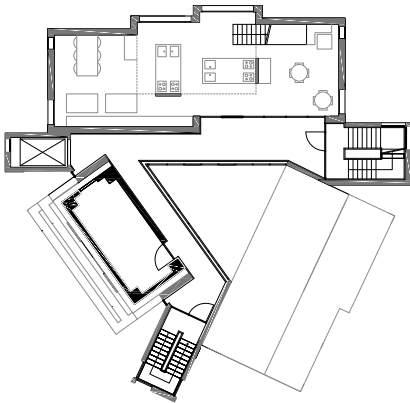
Ninth floor, scaled to fit - storage, kitchen/diner
